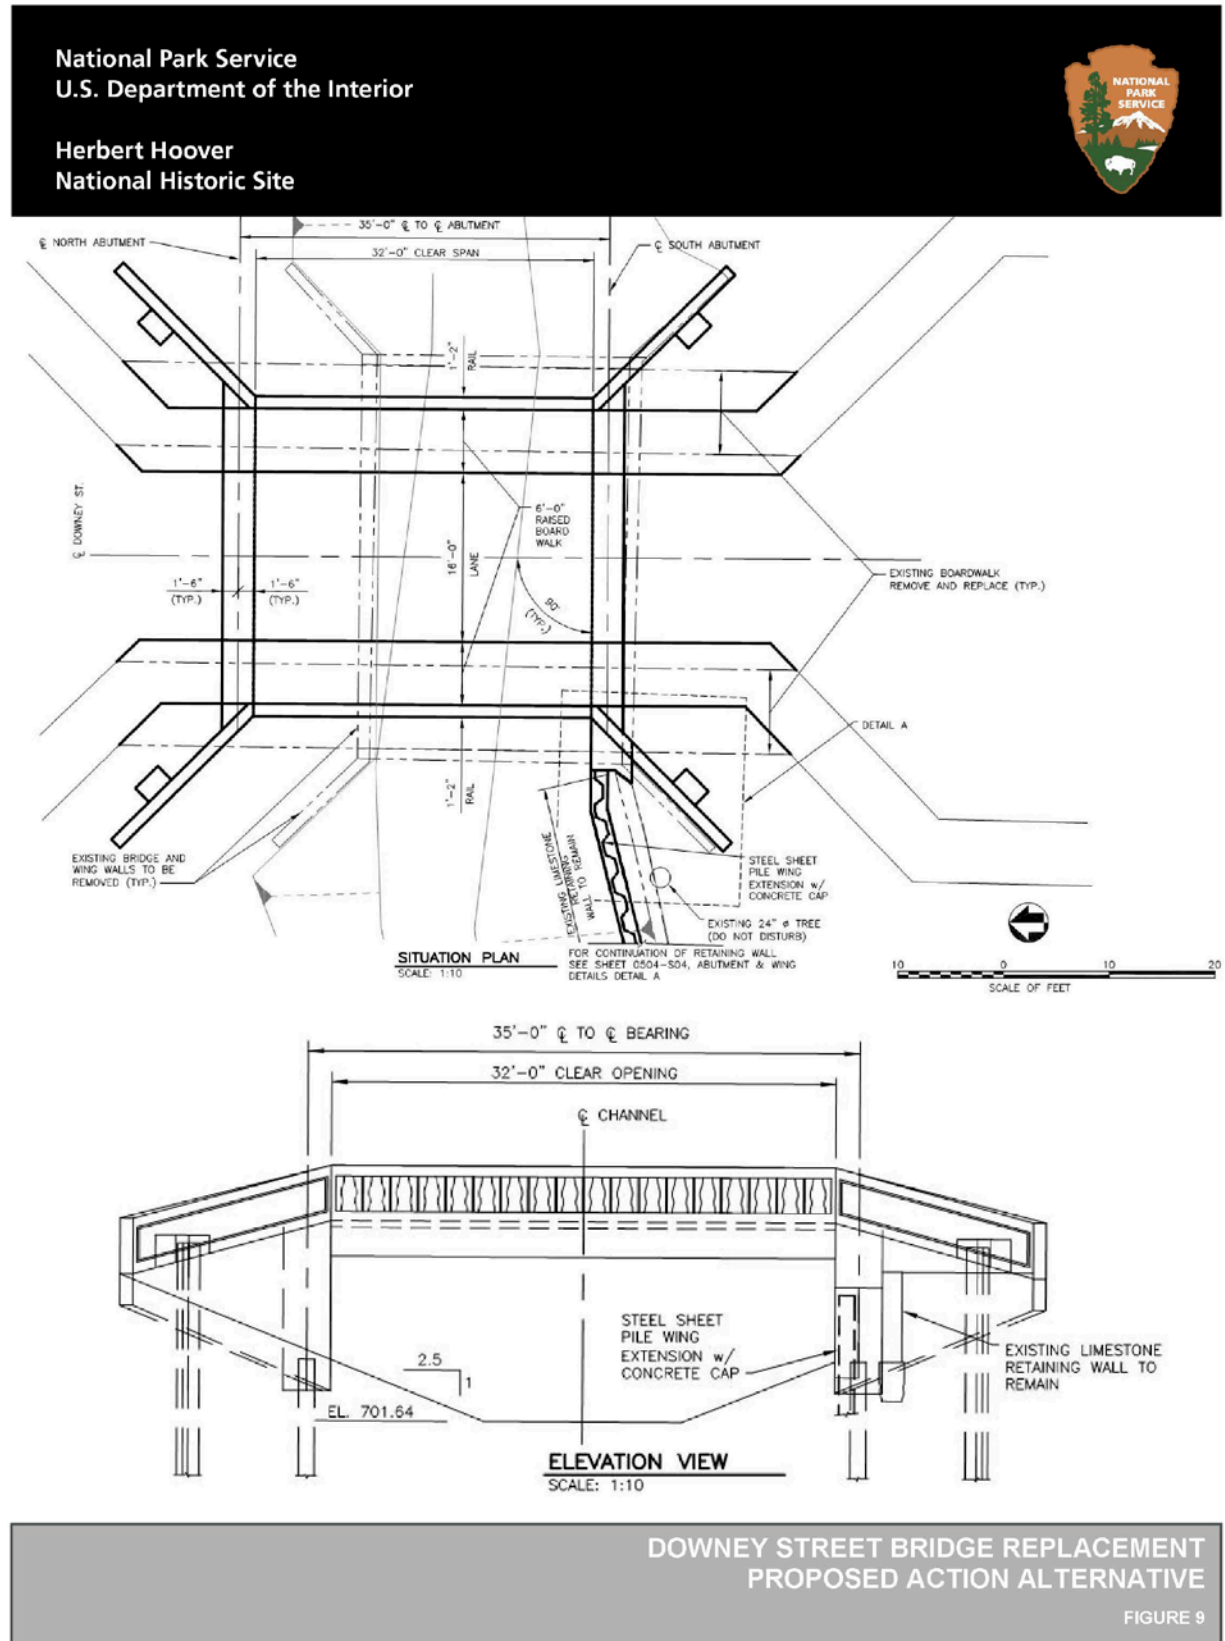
DOWNEY STREET BRIDGE REPLACEMENT
